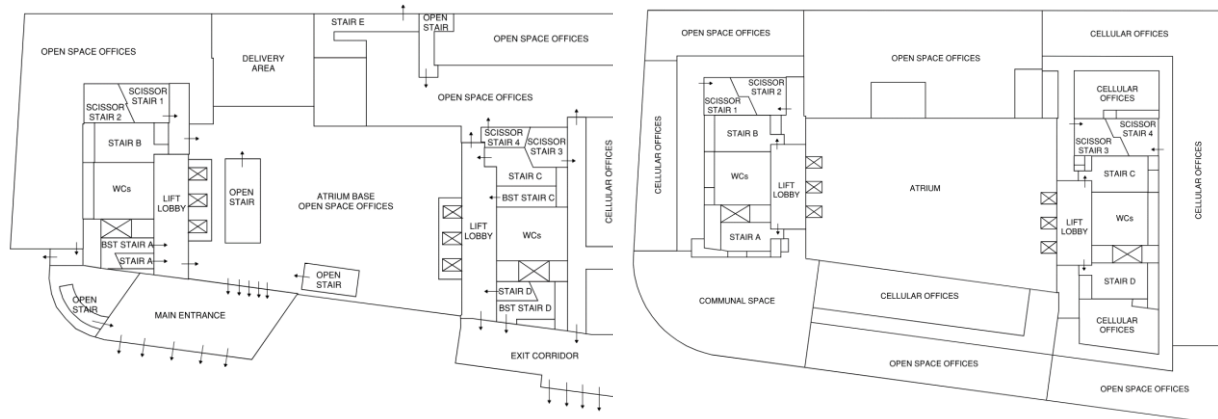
Schematic views of the ground floor (left) and a typical upper floor (right)
